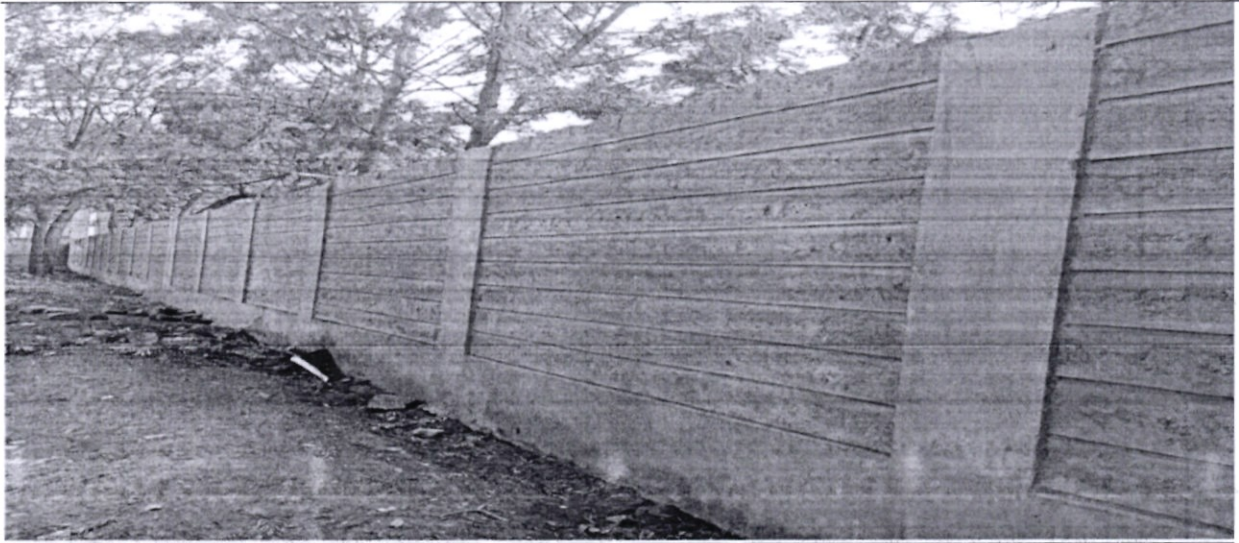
CONSTRUCTION OF PERIMETER WALL AT USHIRIKA PRIMARY SCHOOL
